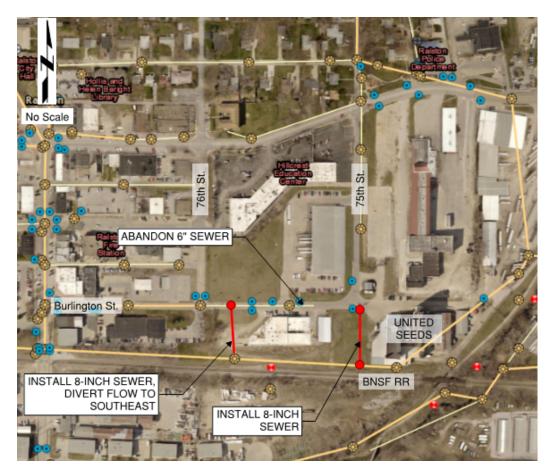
Burlington Street Sanitary Sewer Improvements – Alternative 1
